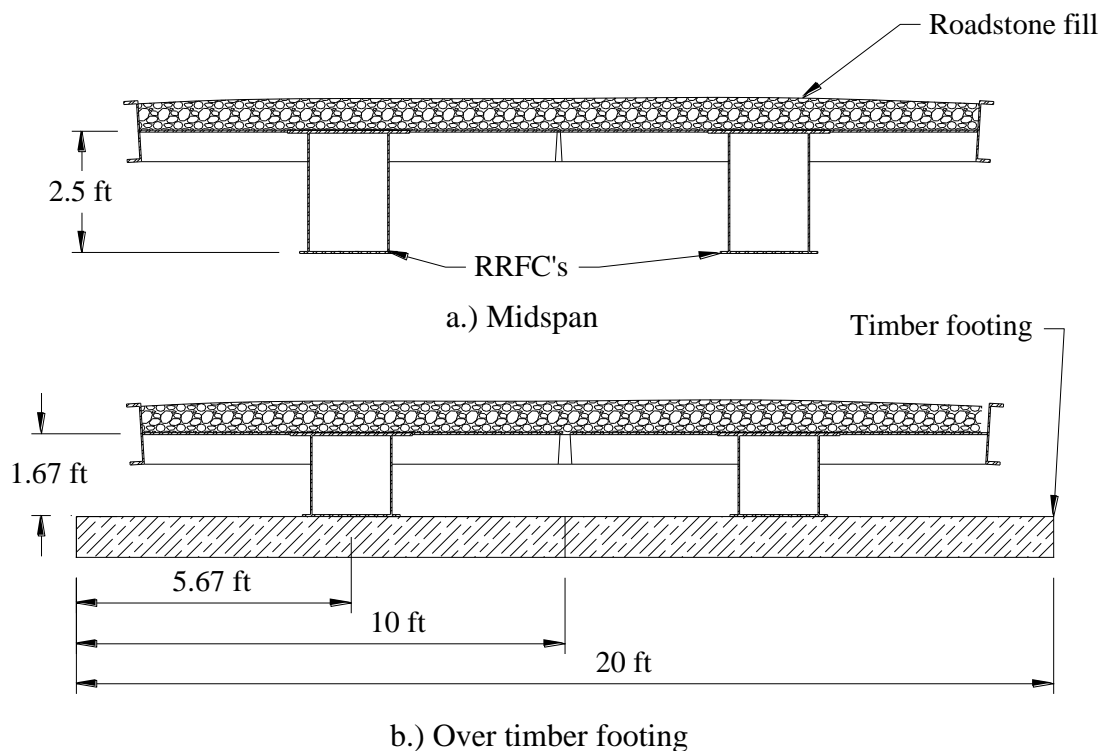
Cross-section of new RRFC bridge superstructure for demonstration project in TC, Iowa
